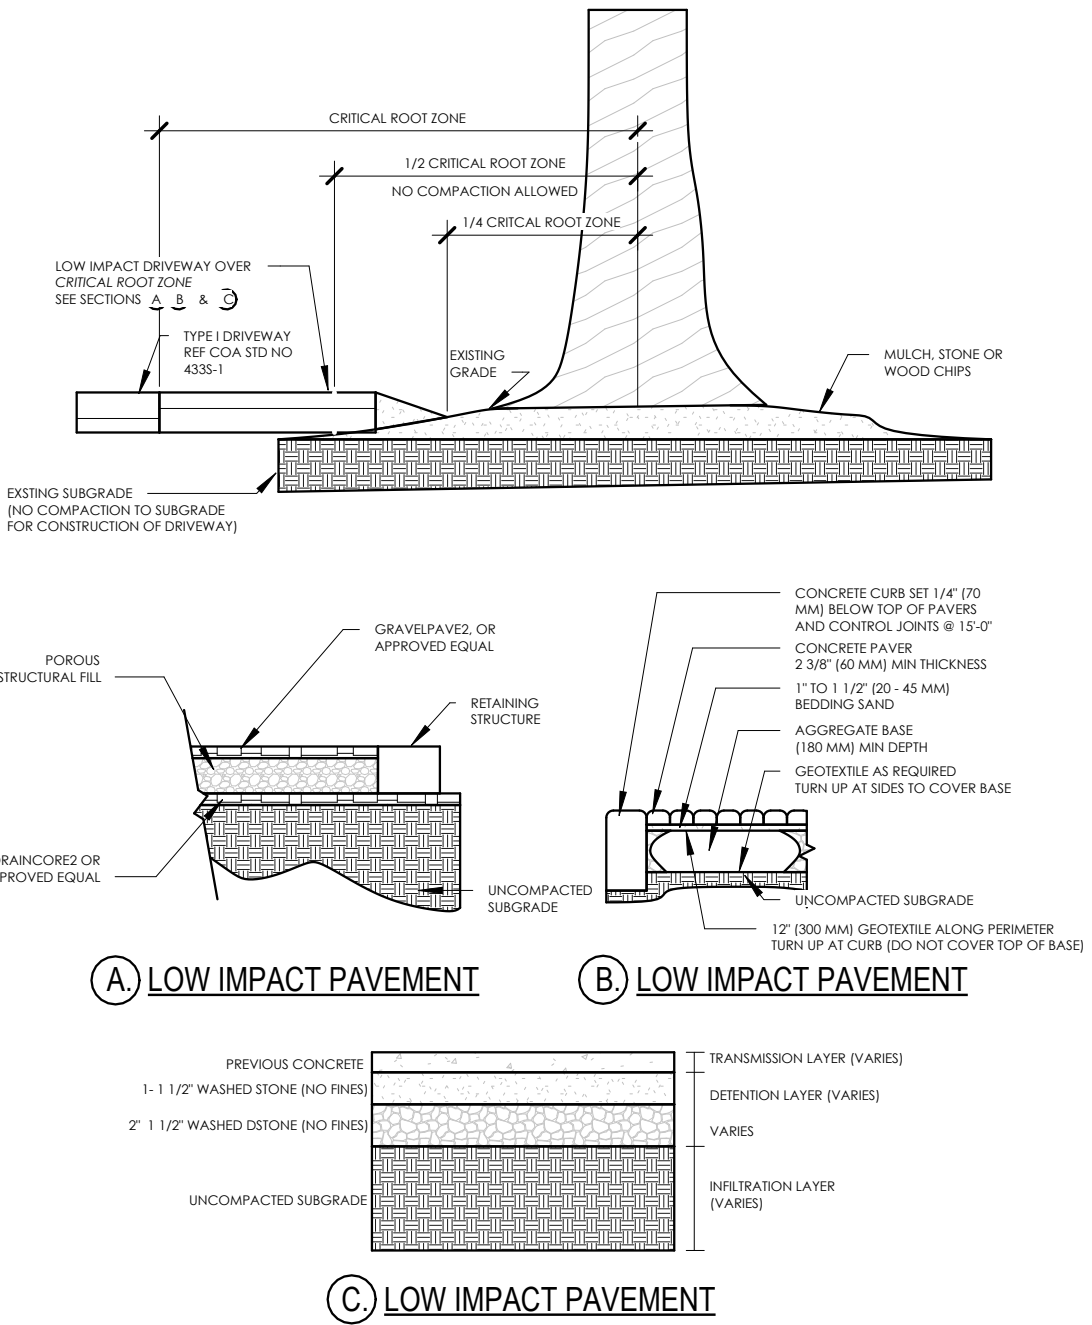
(2 OF 2) LOW IMPACT DRIVEWAY DETAIL
